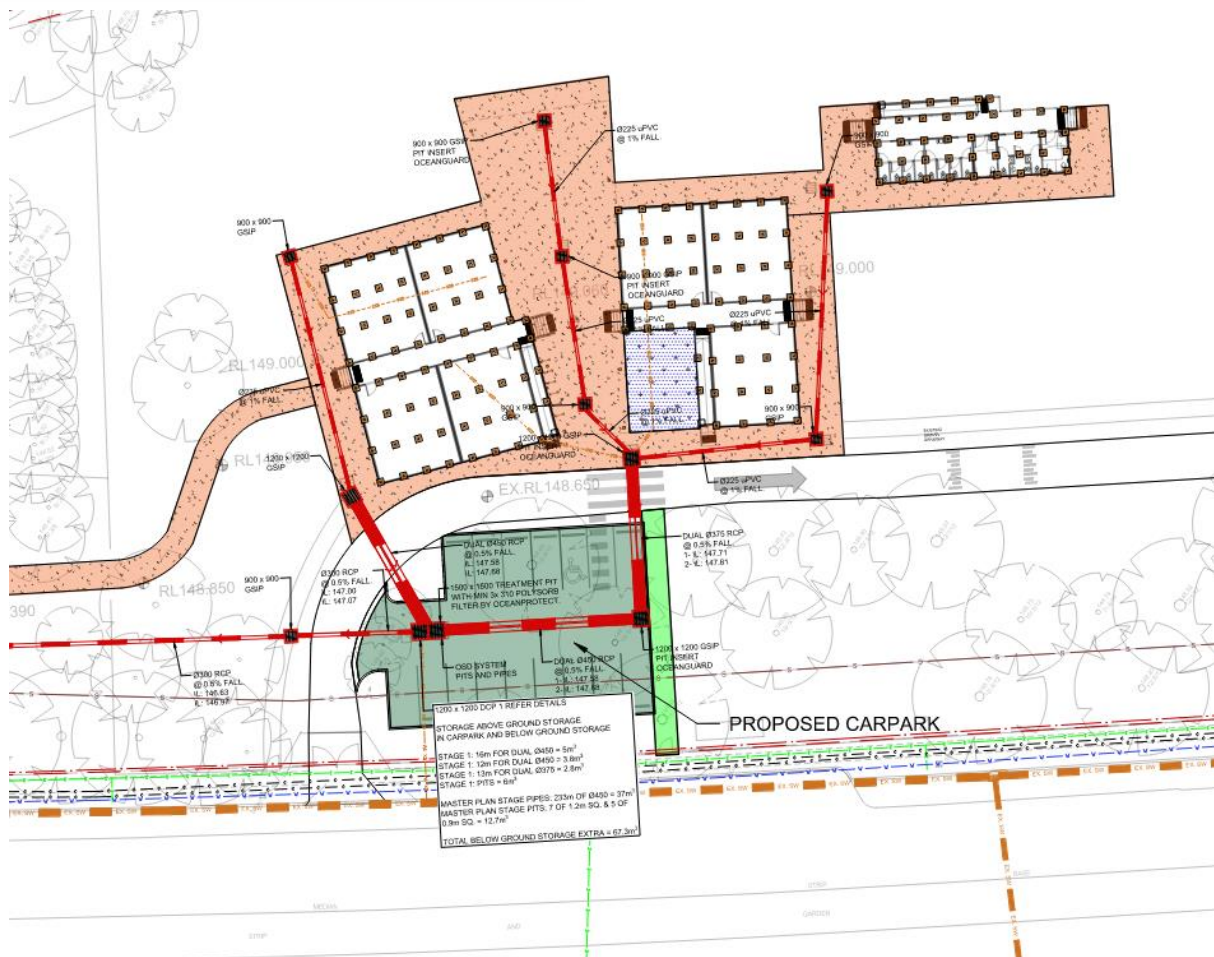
Proposed Stage 1 Stormwater Plan
